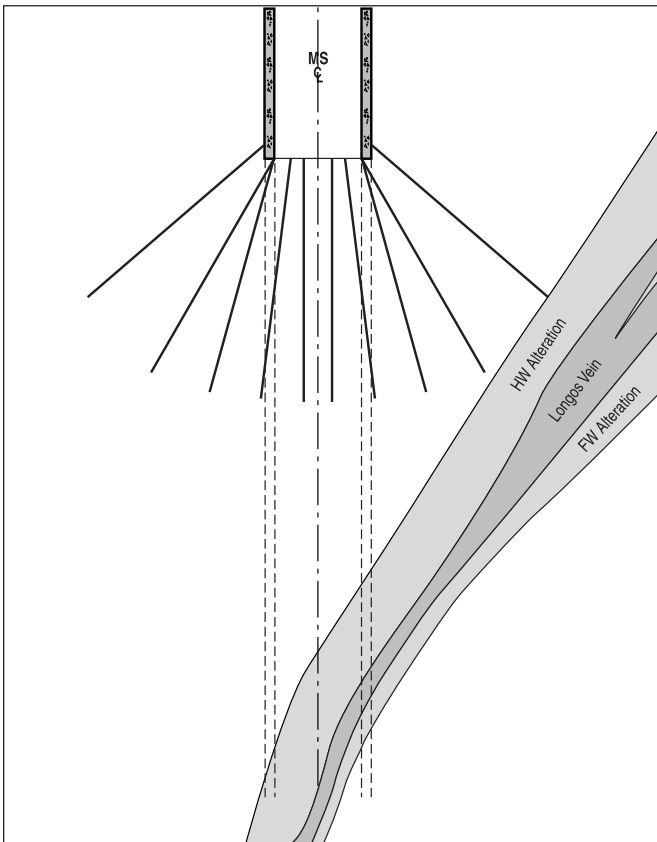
ORIGINAL GROUTING LAYOUT
